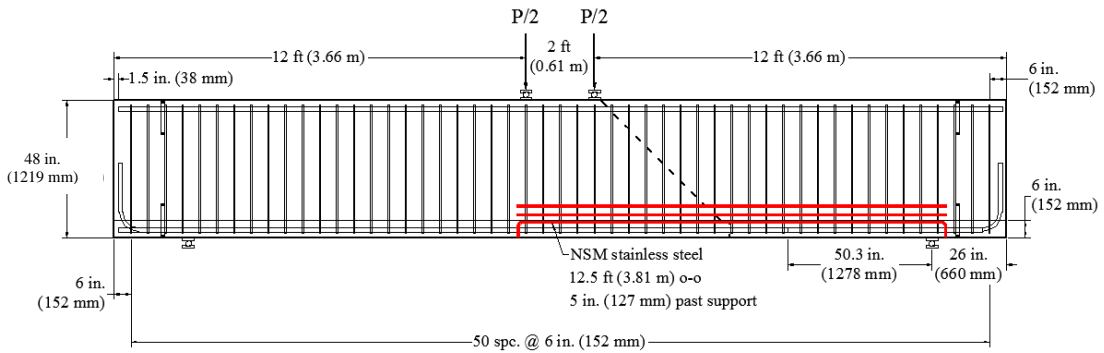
Elevation of specimen IT.45.Ld3(6).SS.
